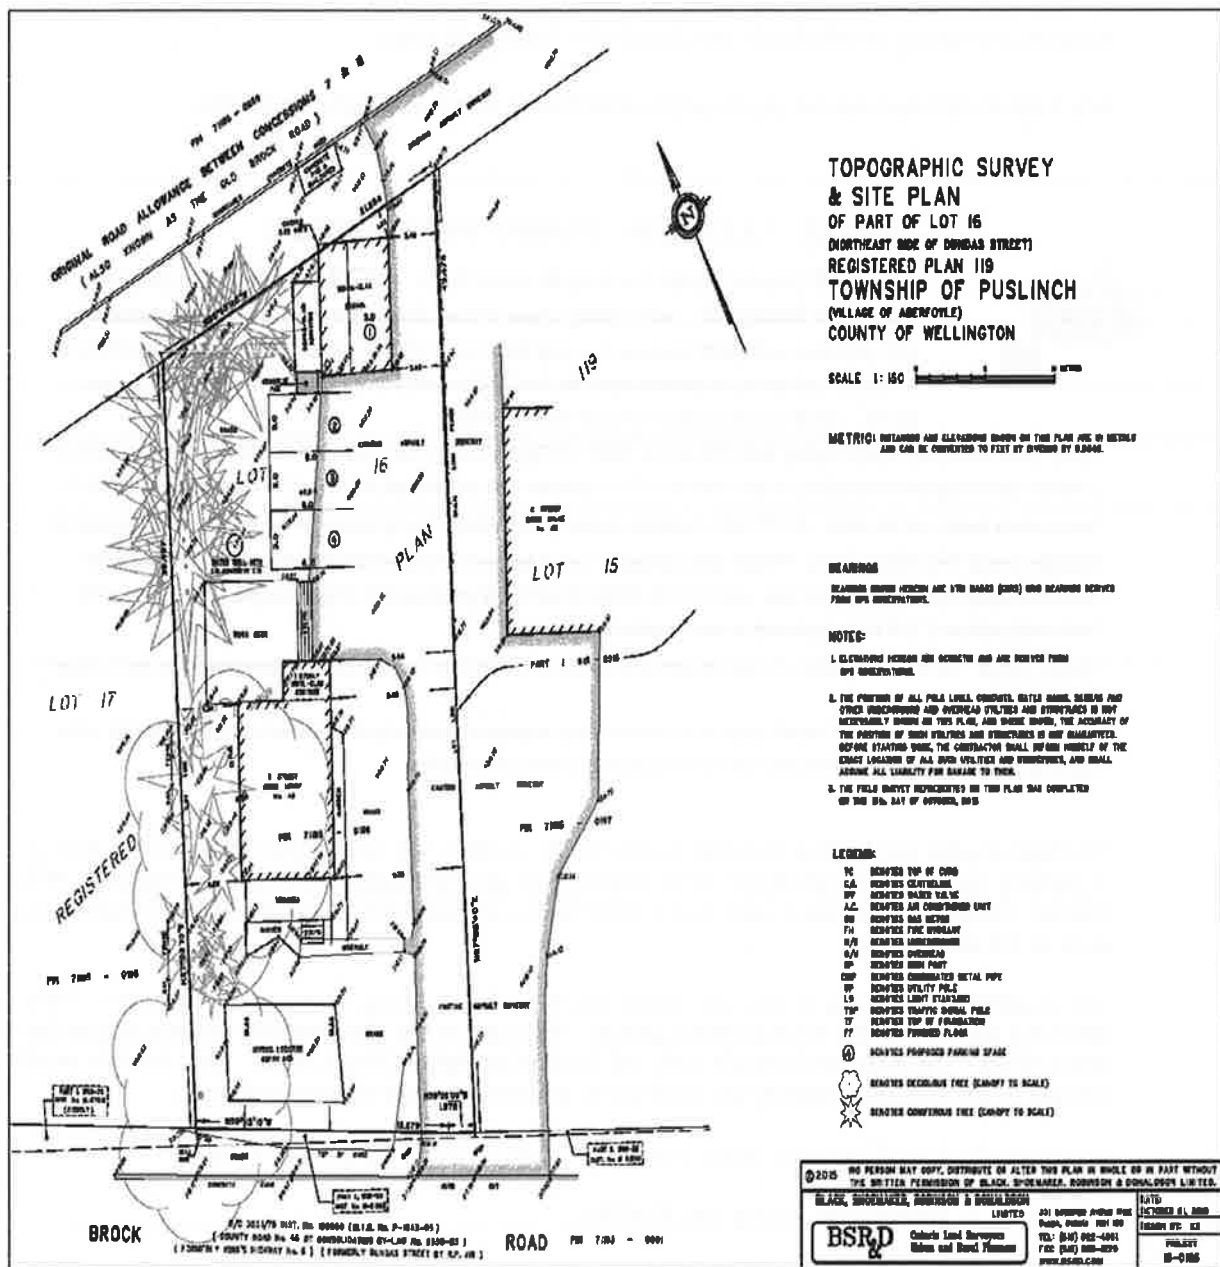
TOPOGRAPHIC SURVEY AND SITE PLAN
